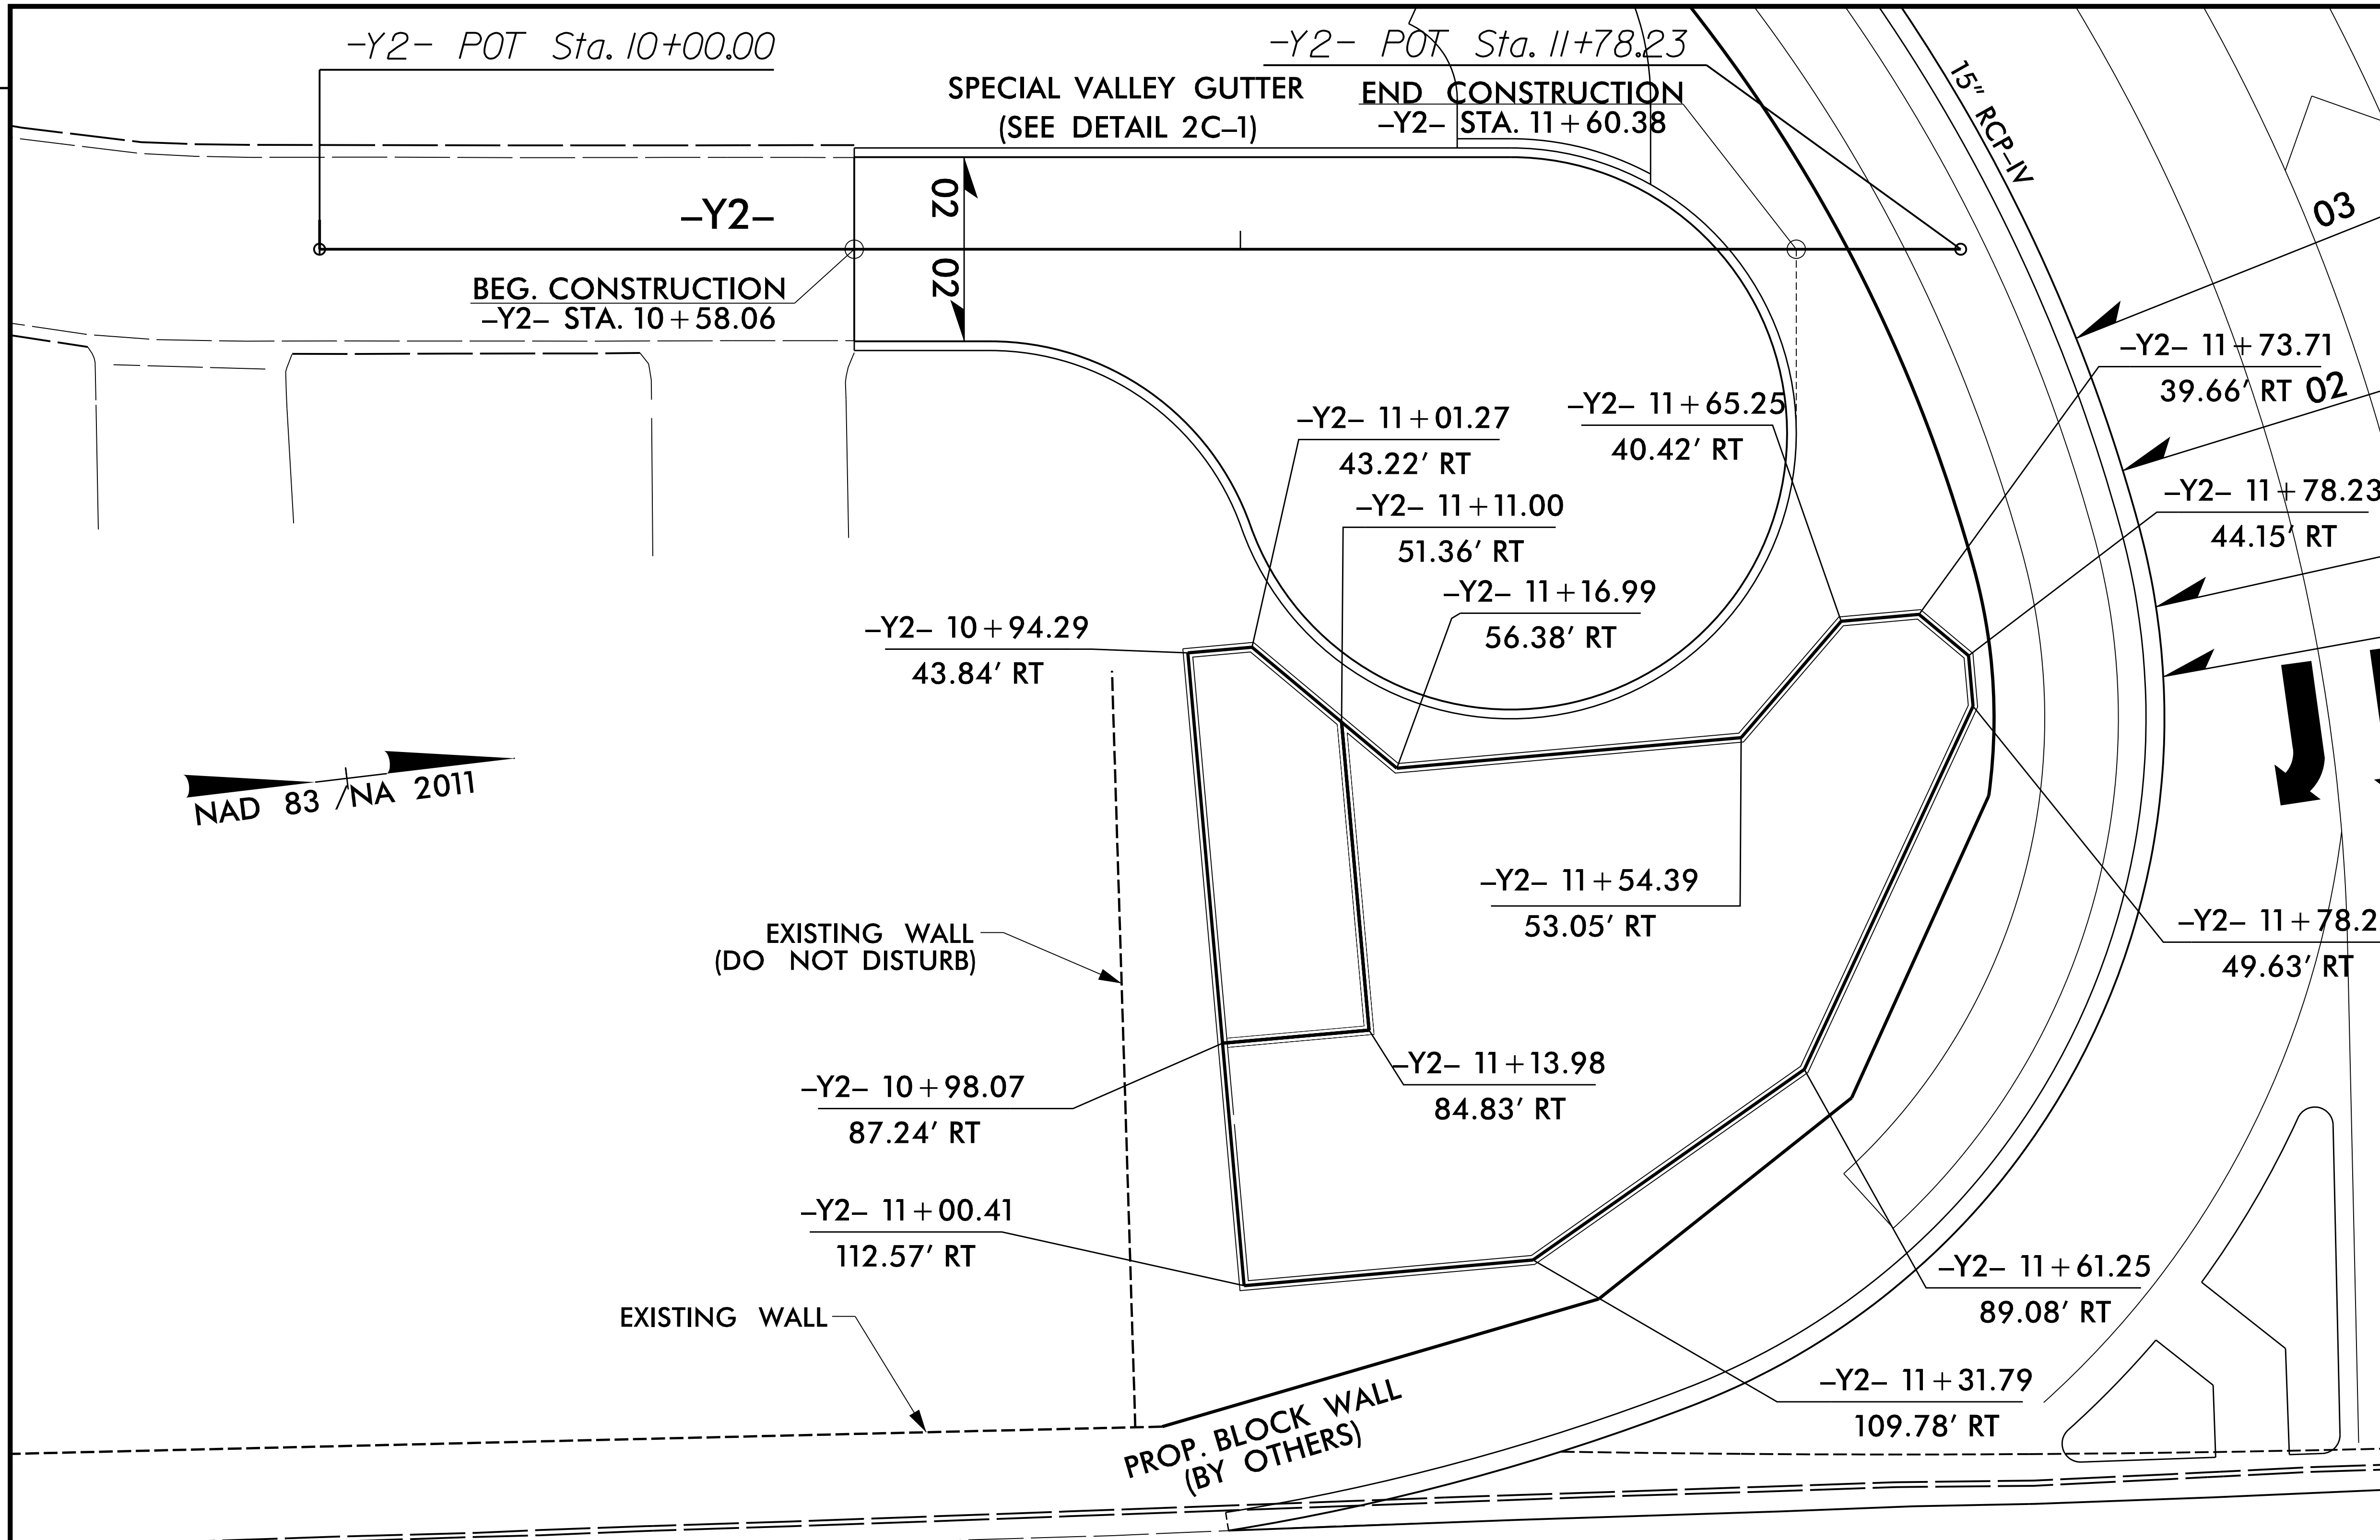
DETAIL SHOWING ELEVATIONS ON CUL-DE-SAC
